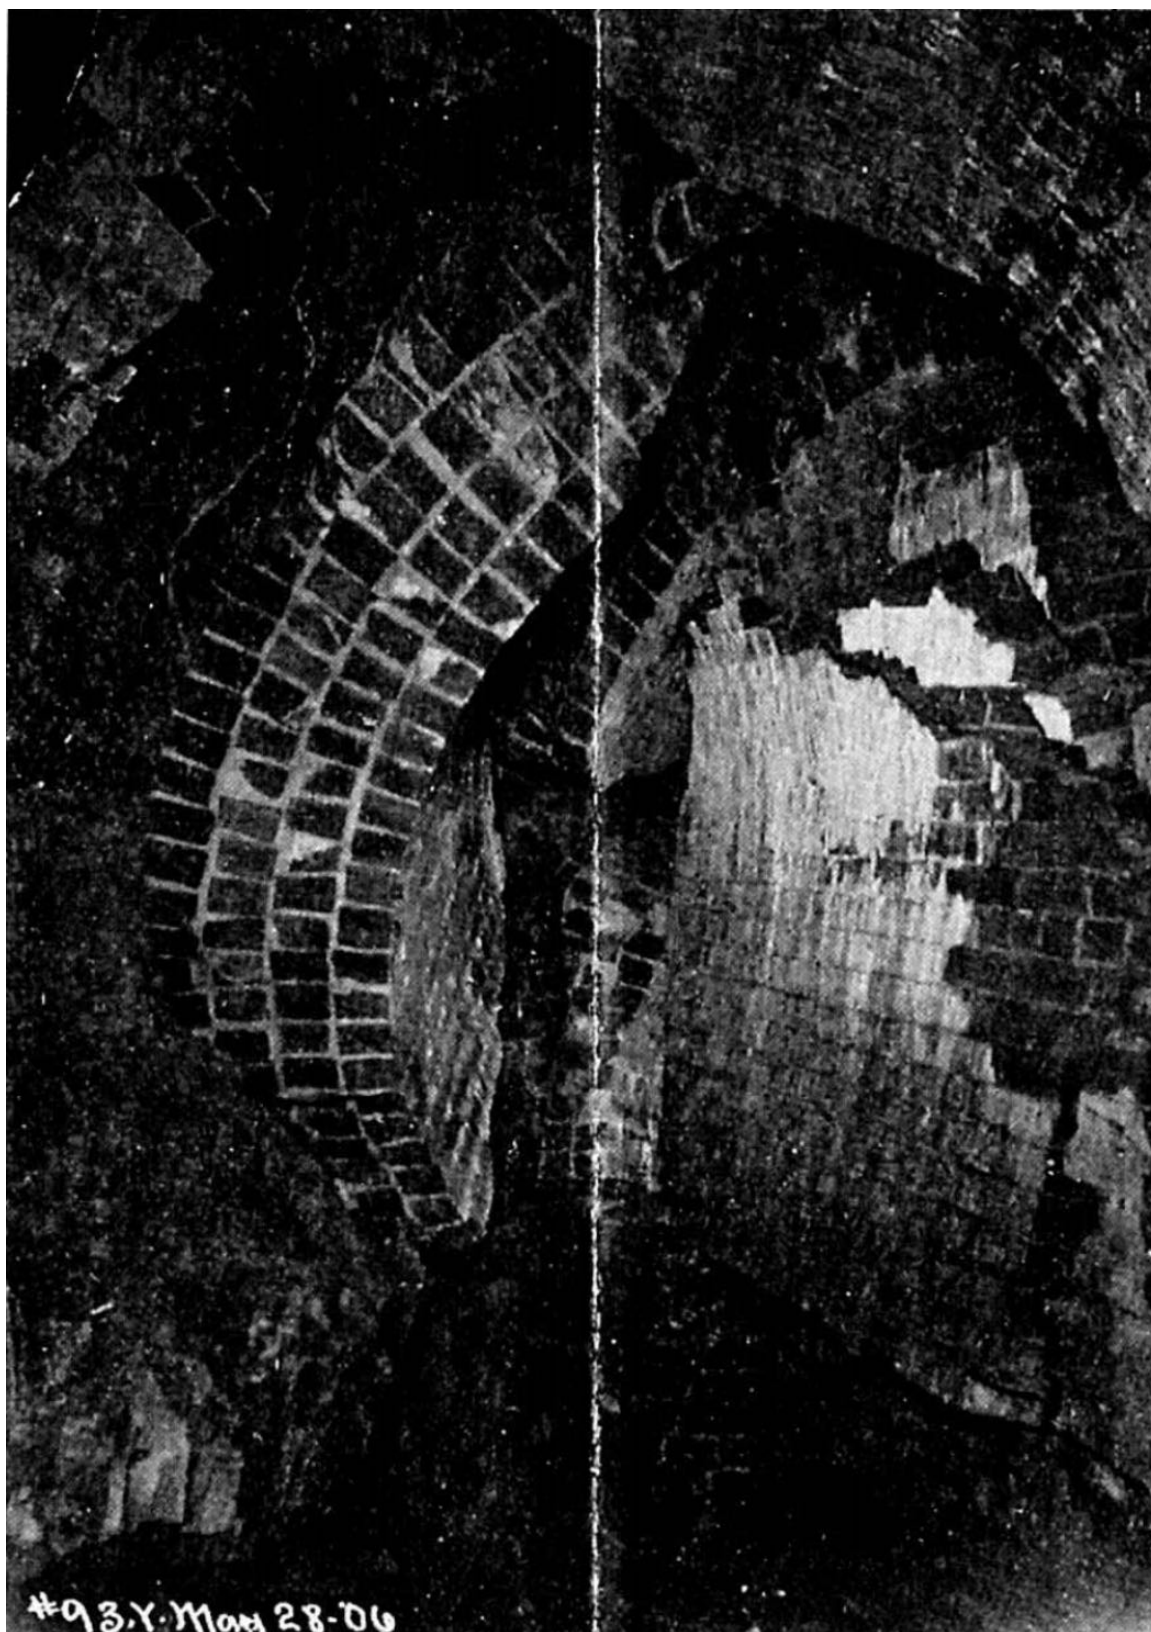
Wastewater Tunnel looking northerly (photo: Schussler HS33)
